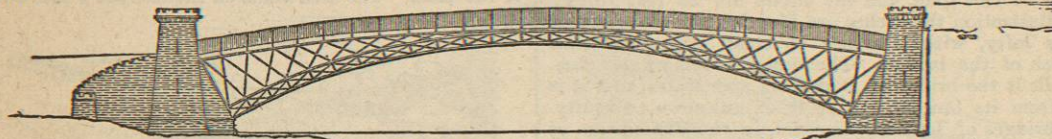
Cast-Iron Bridge at Craigellachie.
